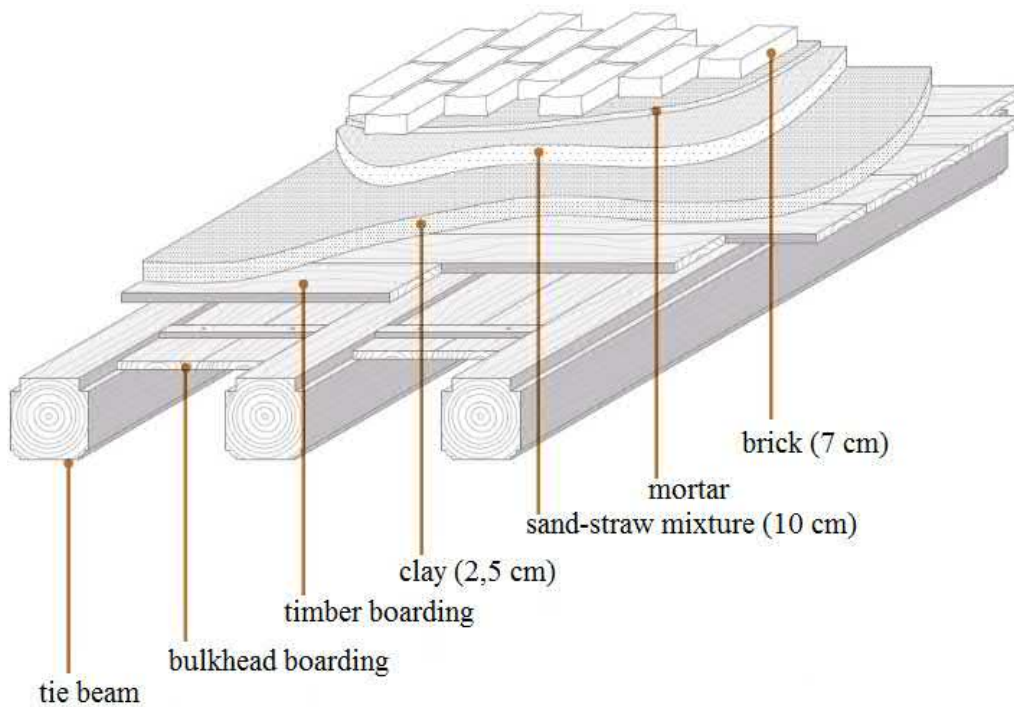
The structural layer of fire bottom between the attic and the third floor [1, p. 135].
